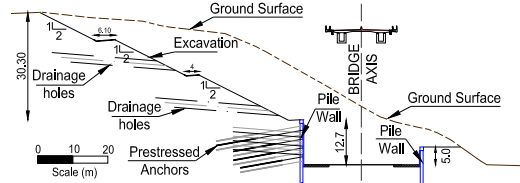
Typical cross-section of open-air excavations with permanent support measures around central pier M1.
